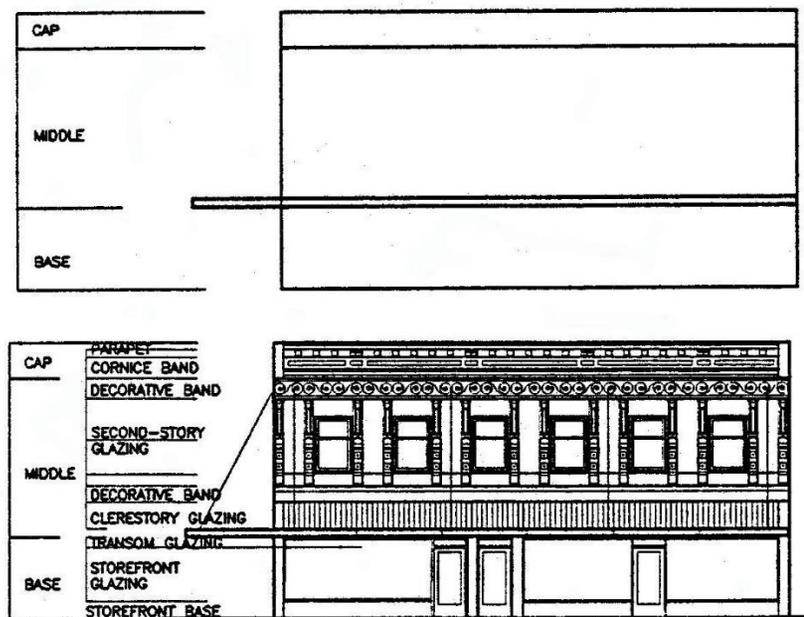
Above, an abstract illustration of required horizontal divisions. Below, an existing example.
